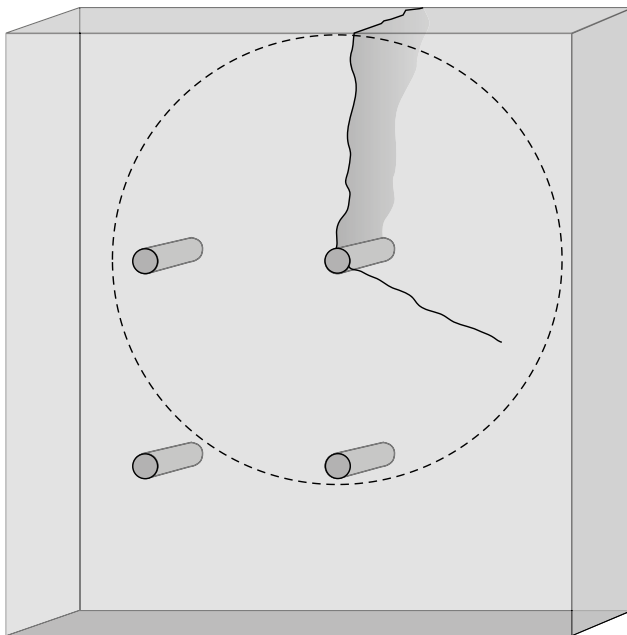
Application of the model for thick-walled cylinder for fracture formation around form rods that penetrate a concrete wall perpendicular to the wall surfaces.
